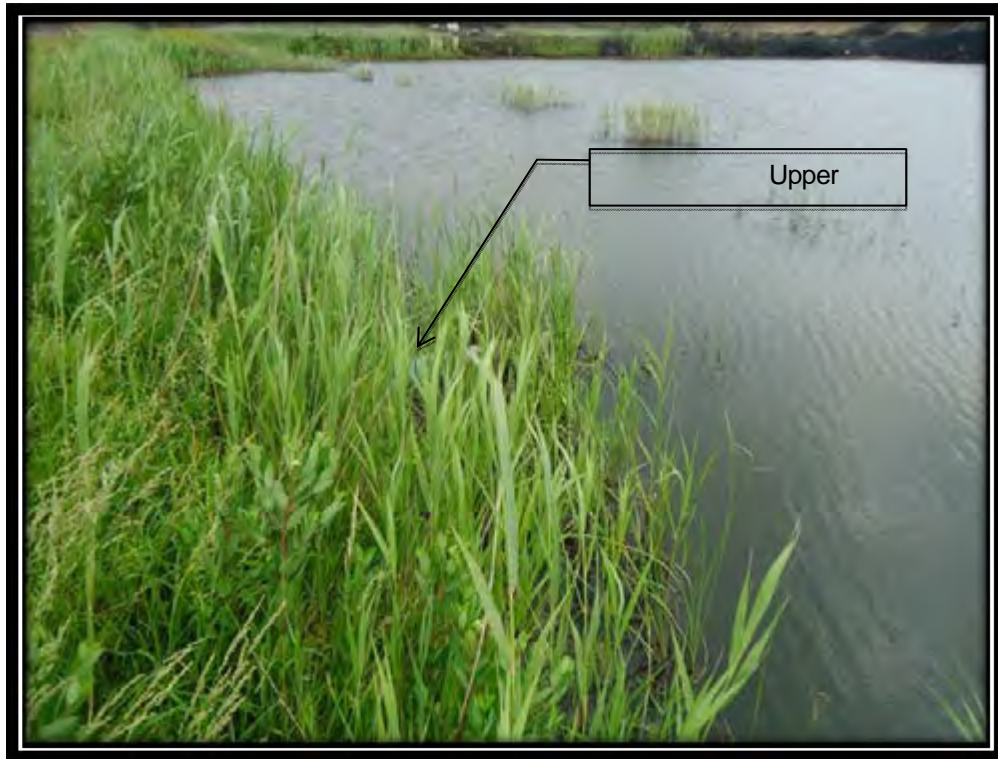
Ash Pond 1 Upper Discharge Pipe into Pond 4
